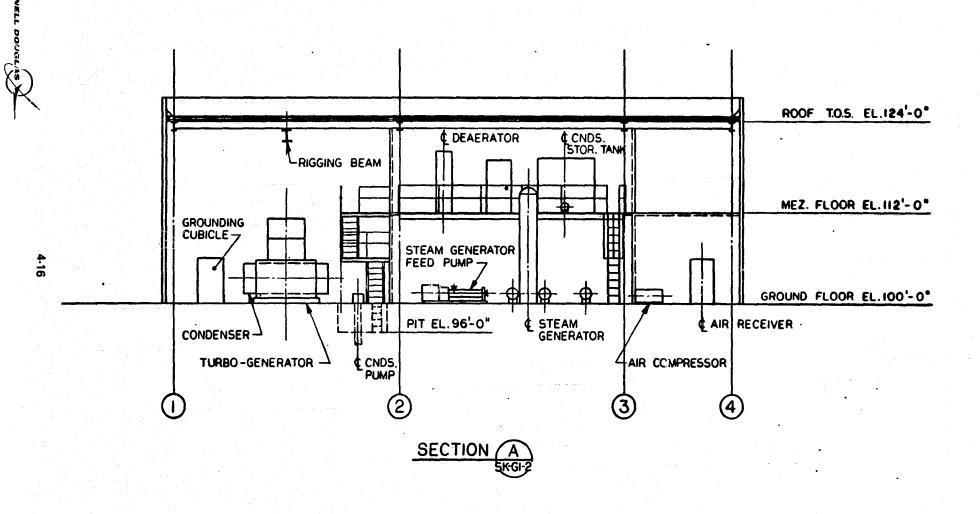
EE-1 Ground Floor Plan (Con't.)
